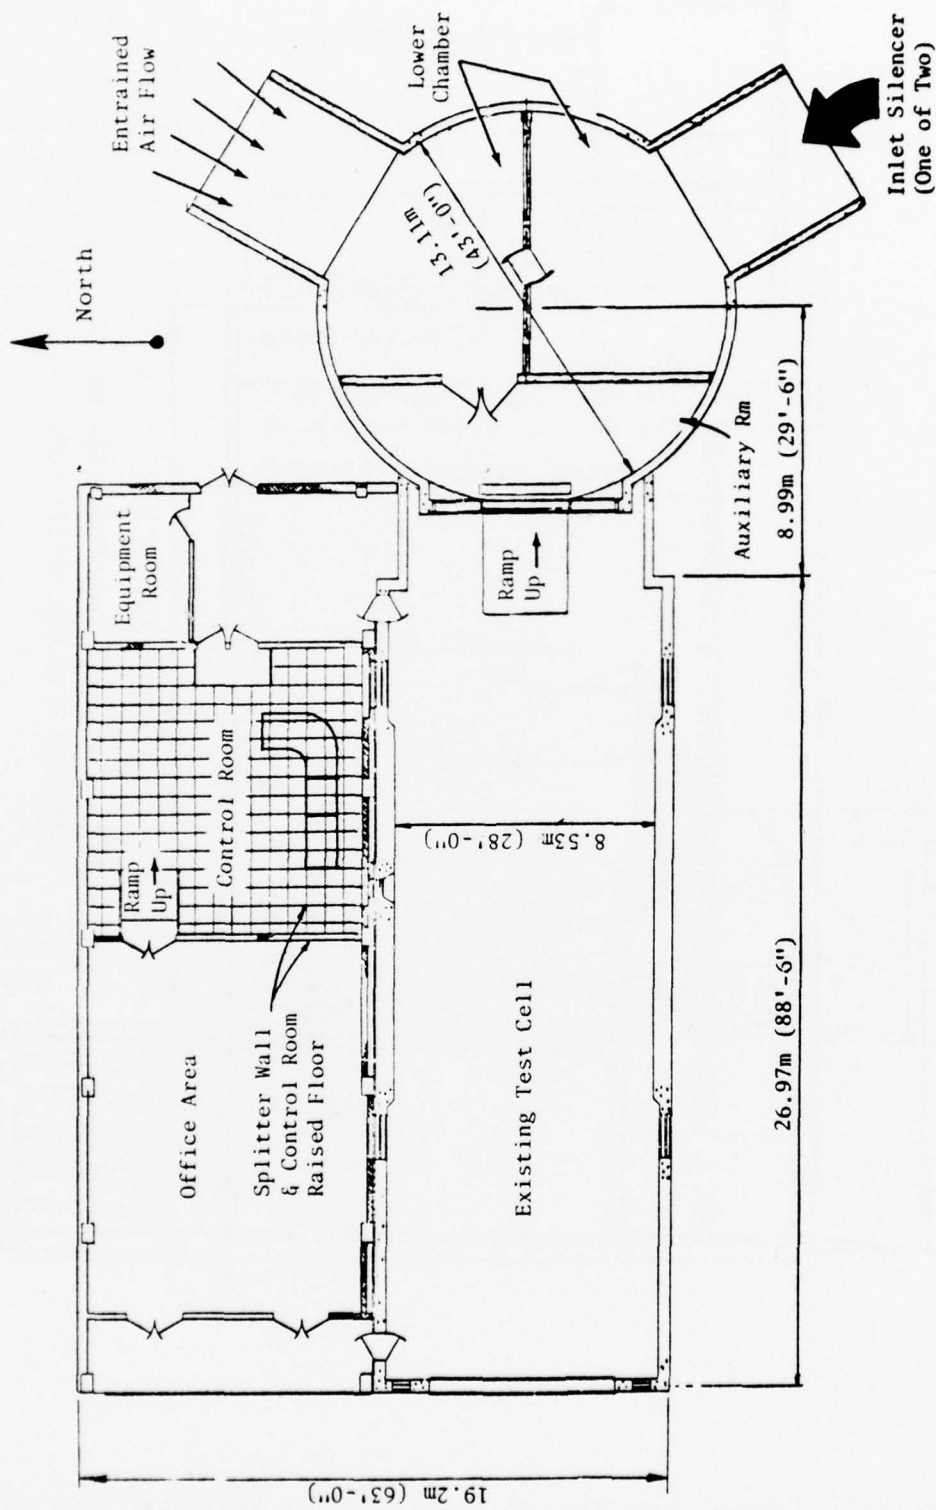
General Electric Jet Noise Anechoic Facility Floor Plan.
